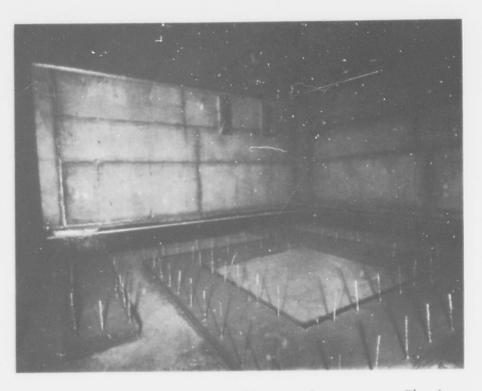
Interior of shielded building, southeast corner. Flooring for cable runways and sewage line has been poured.
